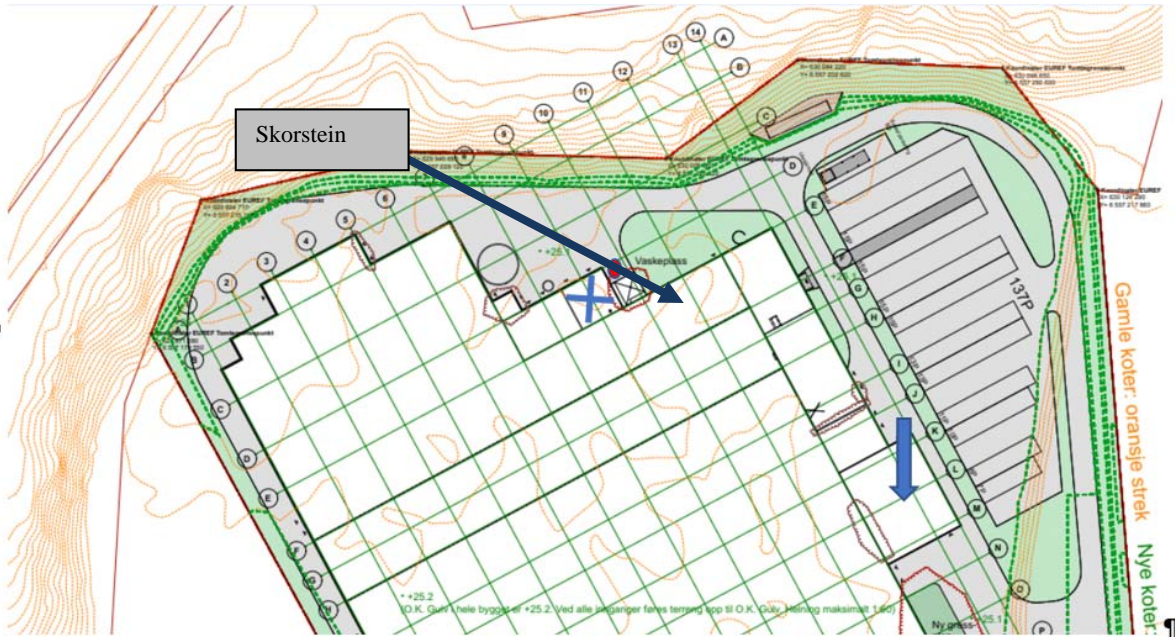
The stack (red dot) is located next to the wall of the boiler room (blue cross). Fresh air intake for building ventilation is located on the roof at of the building near position L13 (blue arrow)
